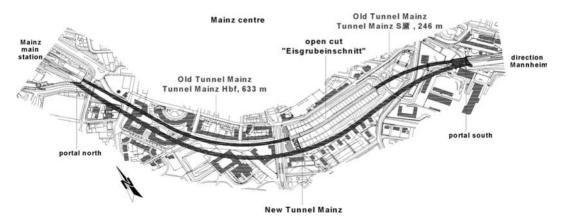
Plan view tunnel situation (Quick et al. 2001).
